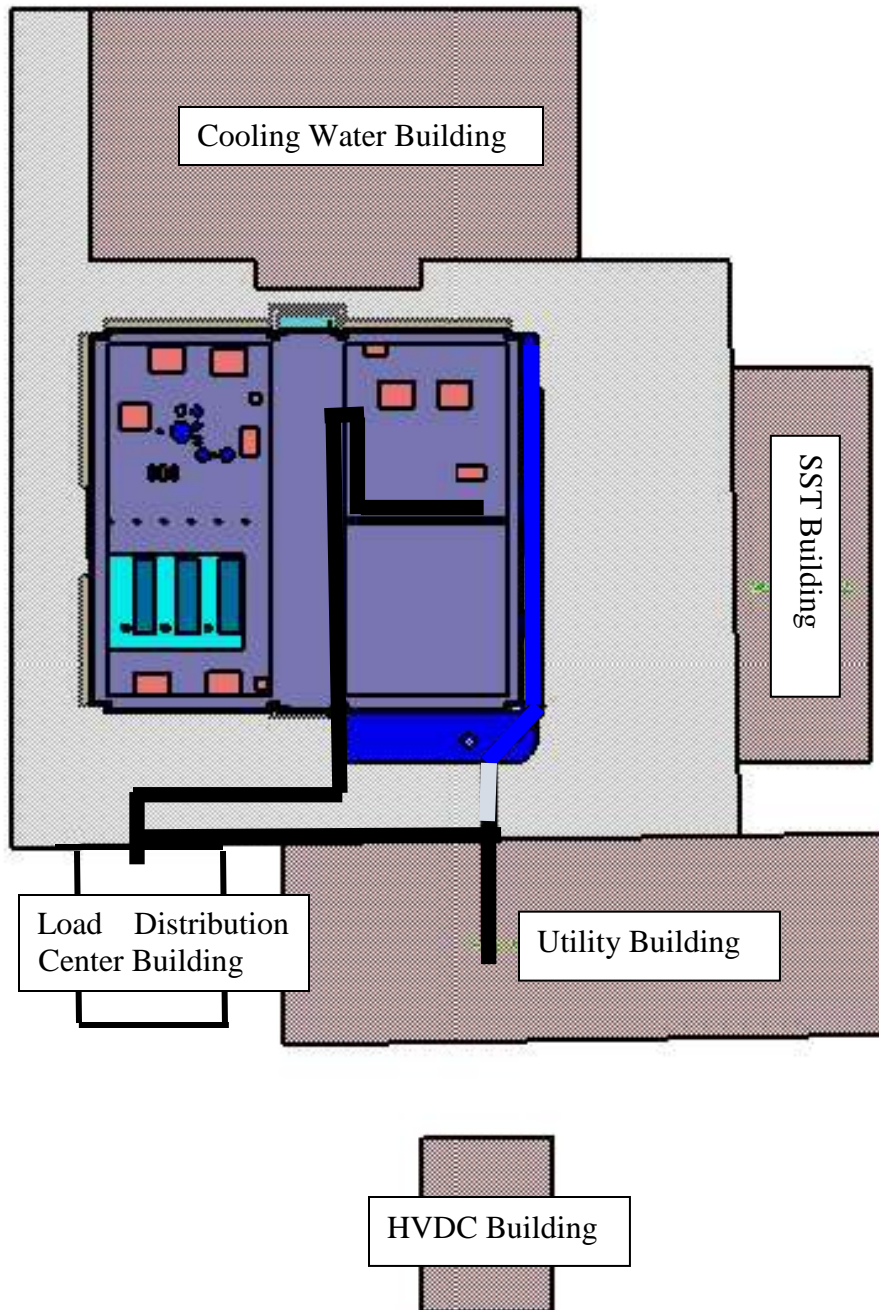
Plan view of cable route and associated building. Route of Cable laying highlighted in bold.
